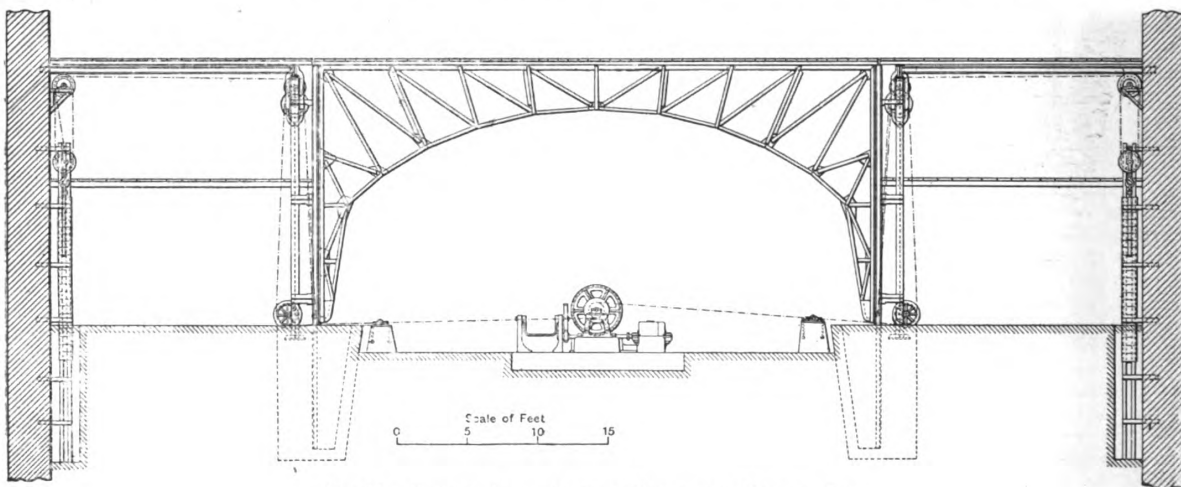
GENERAL ARRANGEMENT OF BRIDGE AND HOISTING GEAR.
